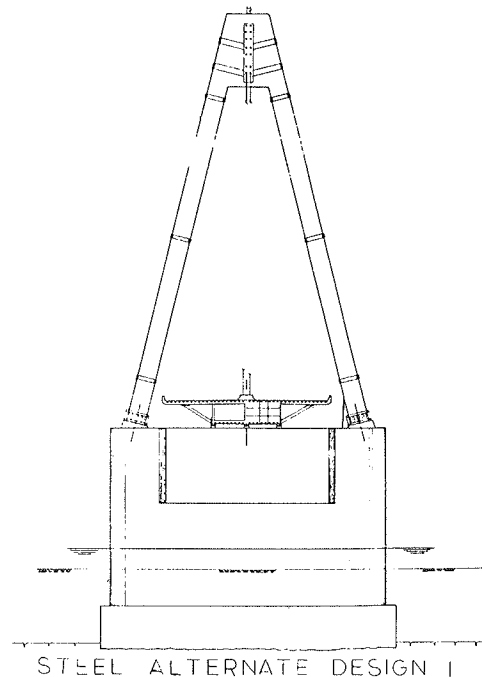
Typical cross section of cable-stayed bridge at pier 5 (design 1).
